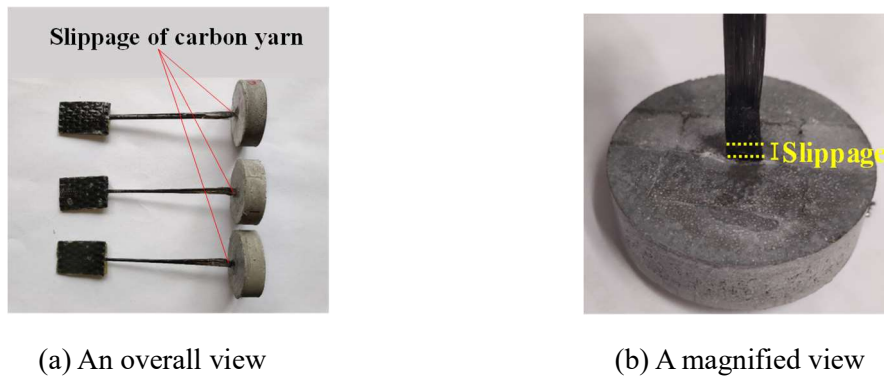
The failure mode of pullout specimens, (a) an overall view and (b) a magnified view
